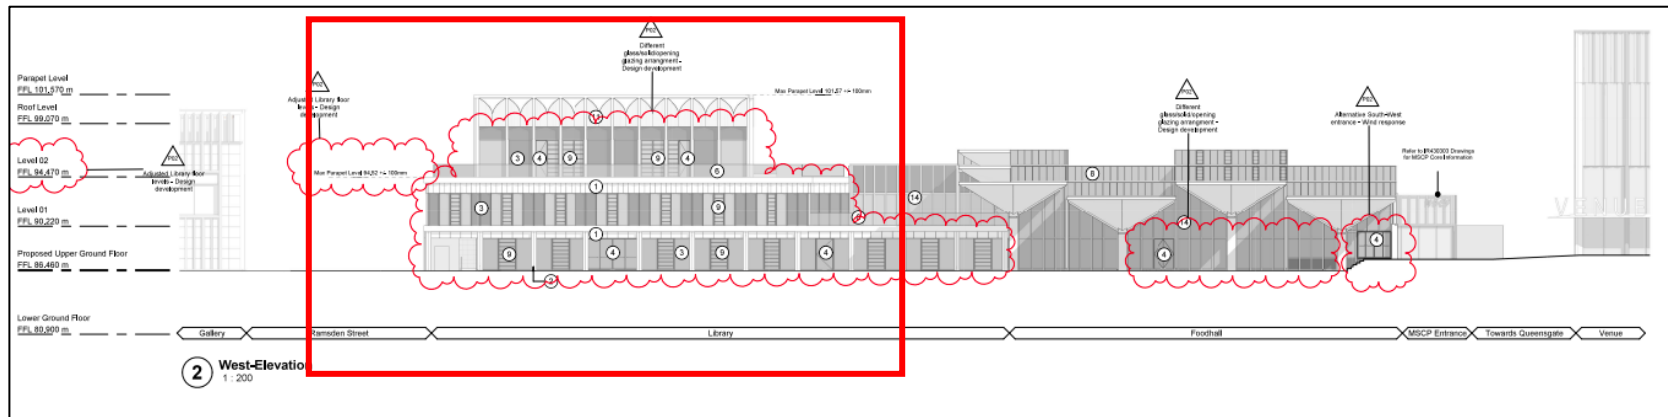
The previously permitted new library building or greater height (Application Ref: 2022/48/93248/W and 2022/65/93235/W)
